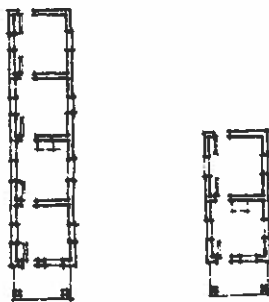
The Shotgun. Floor plans from the Tenth Street Historic District. Most Shotgun houses were originally constructed to be two rooms in depth and were expanded over time.
